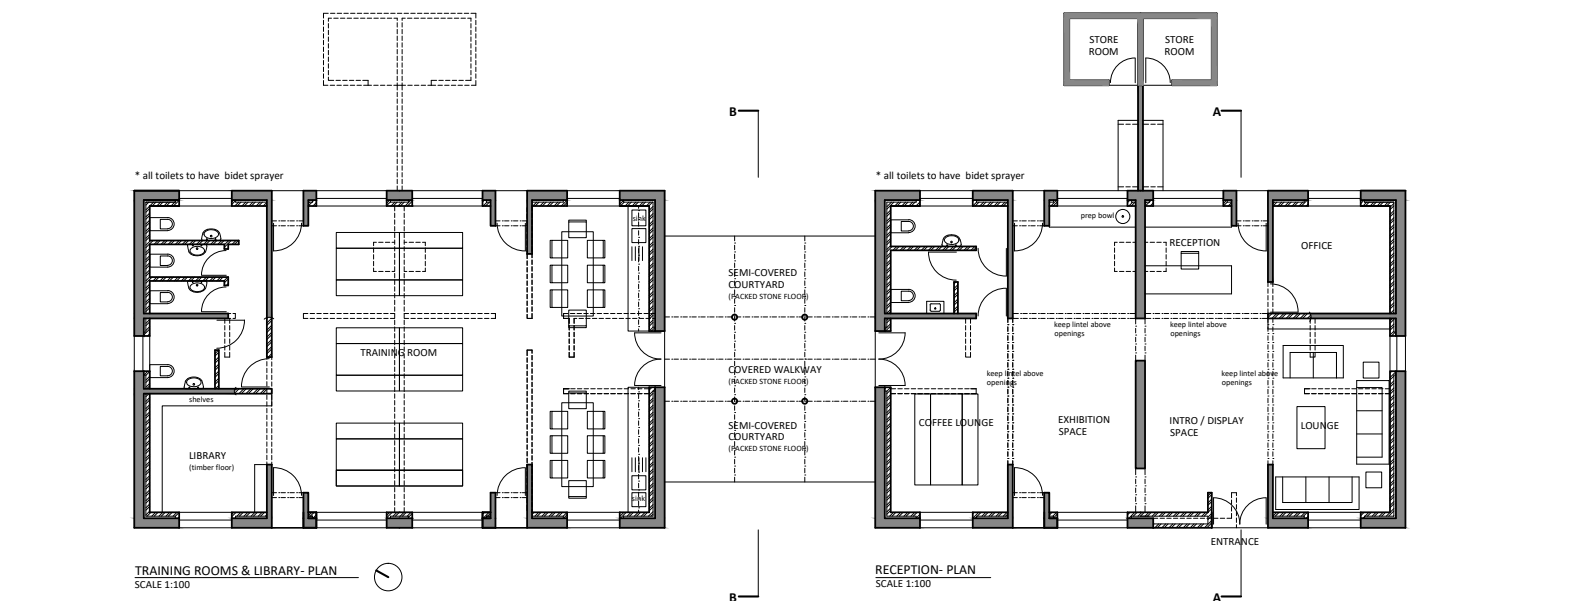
Bertha Retreat Site Development Plan, SK 100 (Tsai Design Studio, 2020)
